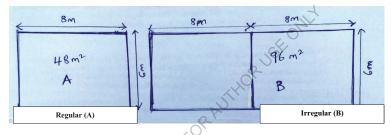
Plans of a Single One-Bedroom (A) and an Undetached Twin One-Bedroom (B) Apartments
